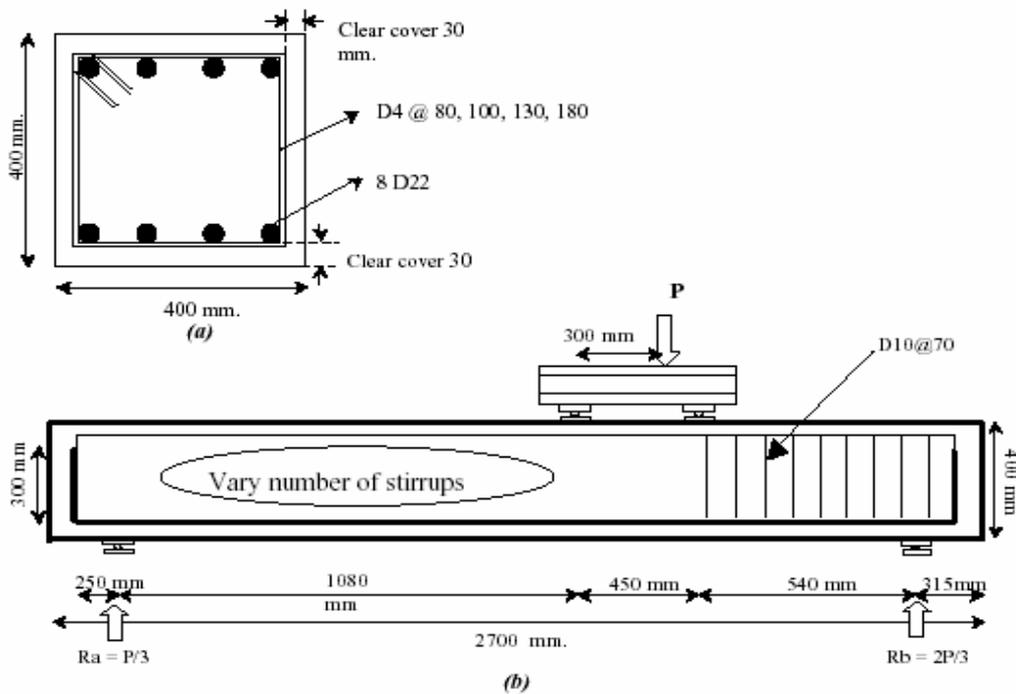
Dimensions and reinforcement details of Songkram Piyamahat et al, beams
